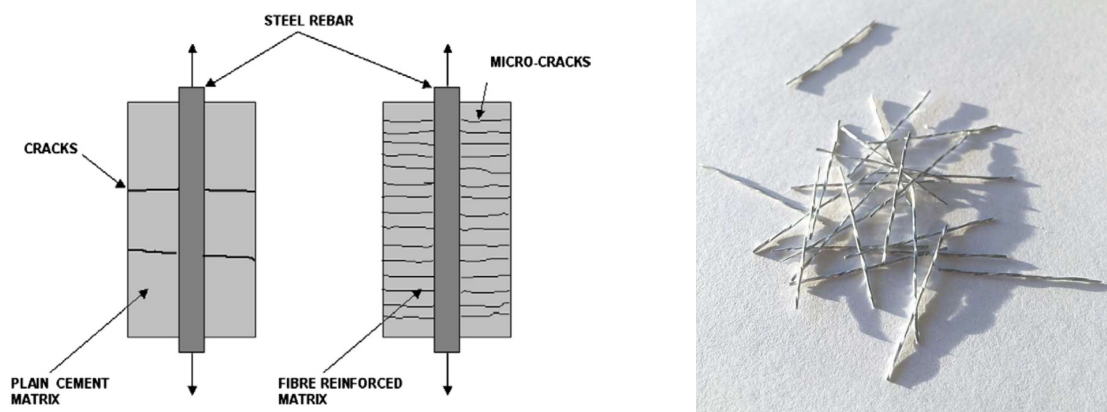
a) Crack pattern in reinforced concrete (RC) and fibre reinforced concrete (FRC) elements subjected to tension [36]. b) Twisted steel fibres by the company Helix Steel [37].
